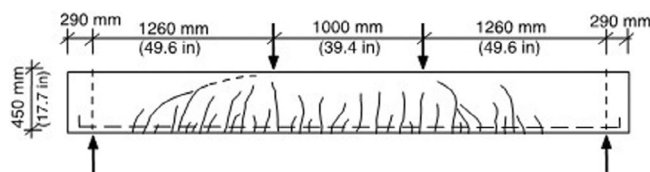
Sustained loading tests on beams without shear reinforcement.³
